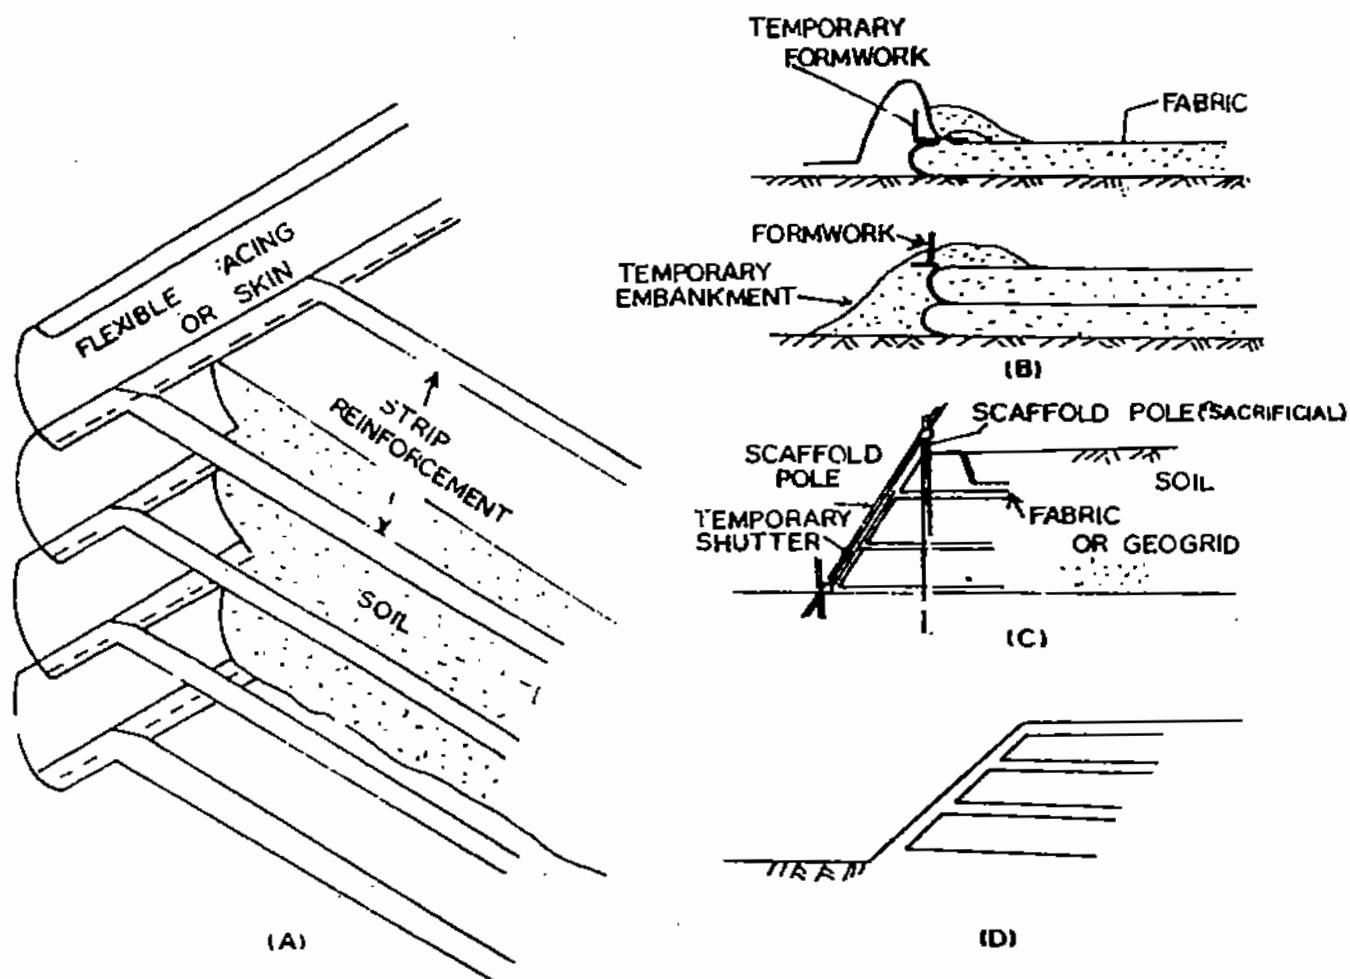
CONCERTINA CONSTRUCTION METHOD - (A) WITH METTALIC FACE (B) FABRIC WALL (C) & (D) SLOPING.
